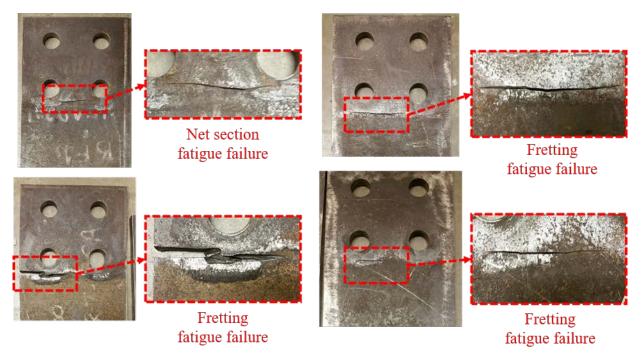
Typical Fatigue Failures of ASTM A709 Grade 50CR Steel Bolted Connection Plates
